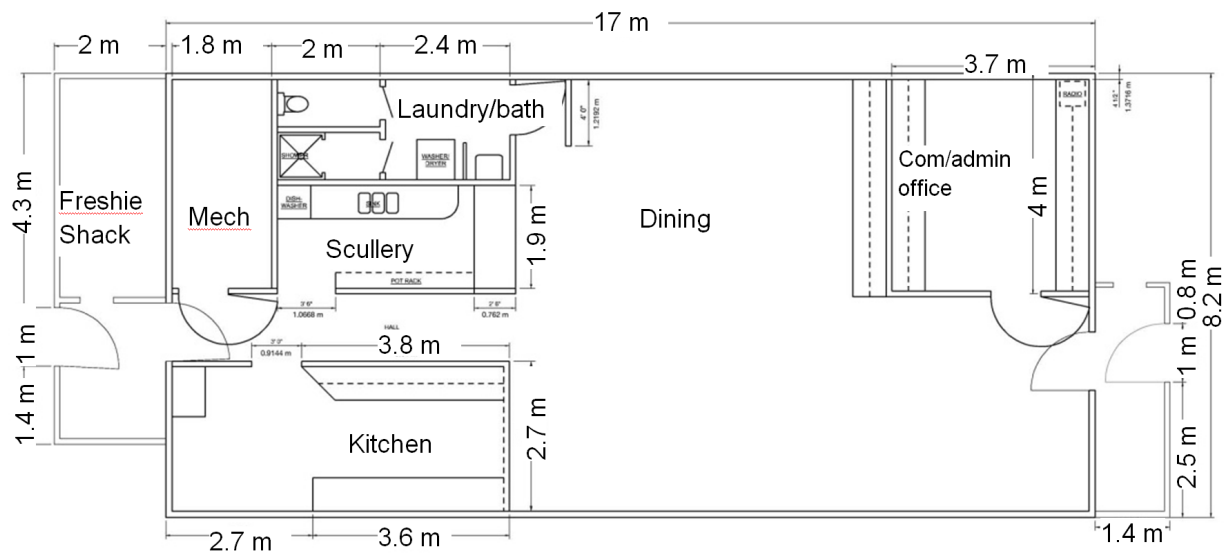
Plan view of Big House (modified from CPS [2010] Big House Floor Plan).
